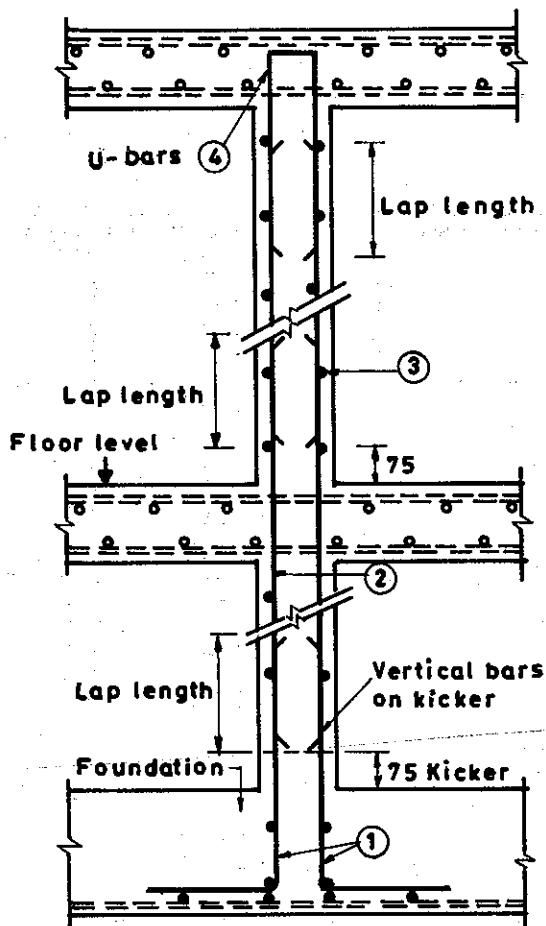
Reinforcement layout in walls (1. Foundation bars; 2. Vertical bars; 3. Horizontal bars; 4. U-bars).
